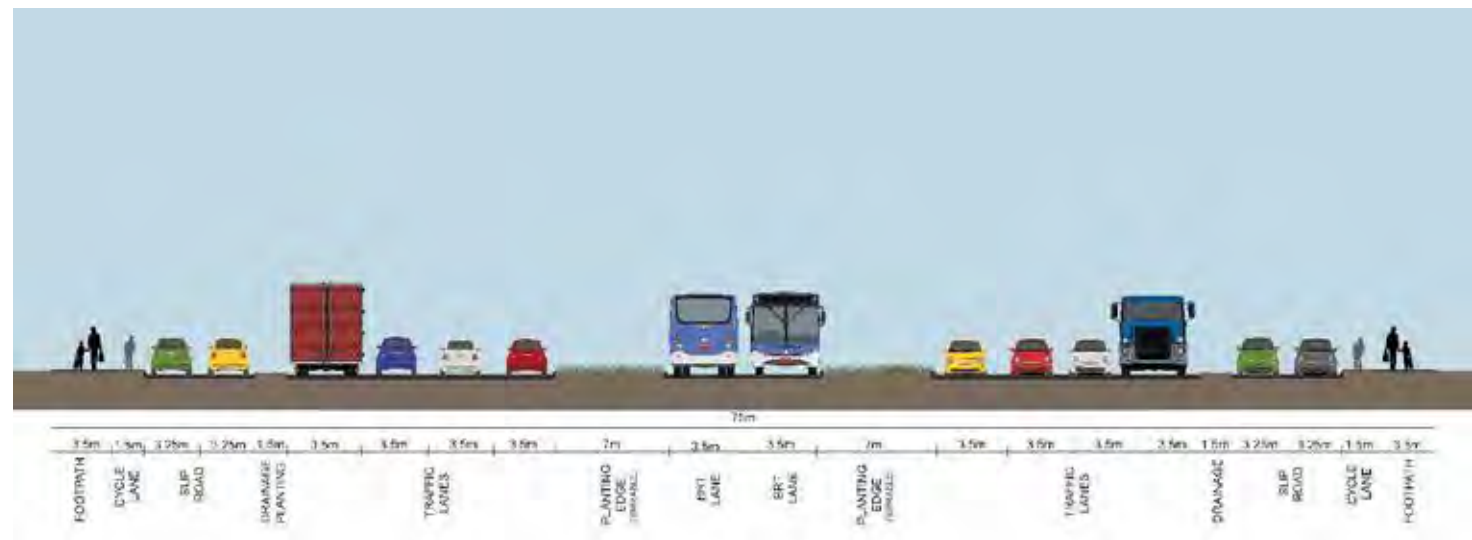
Mombasa Road Proposed Cross Section (Source: DAR)
